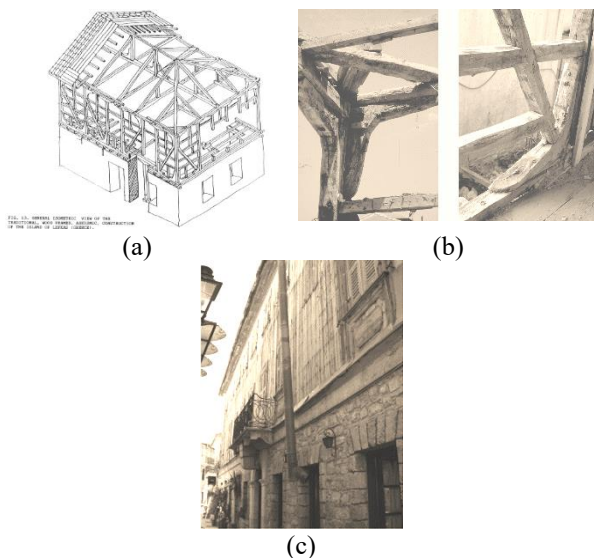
Island of Lefkada, Greece (a) Typical historical building, (b) Connections of timber elements, (c) Protection of timber-framed walls using timber planks (Vintzileou and Touliatos, [25]).
